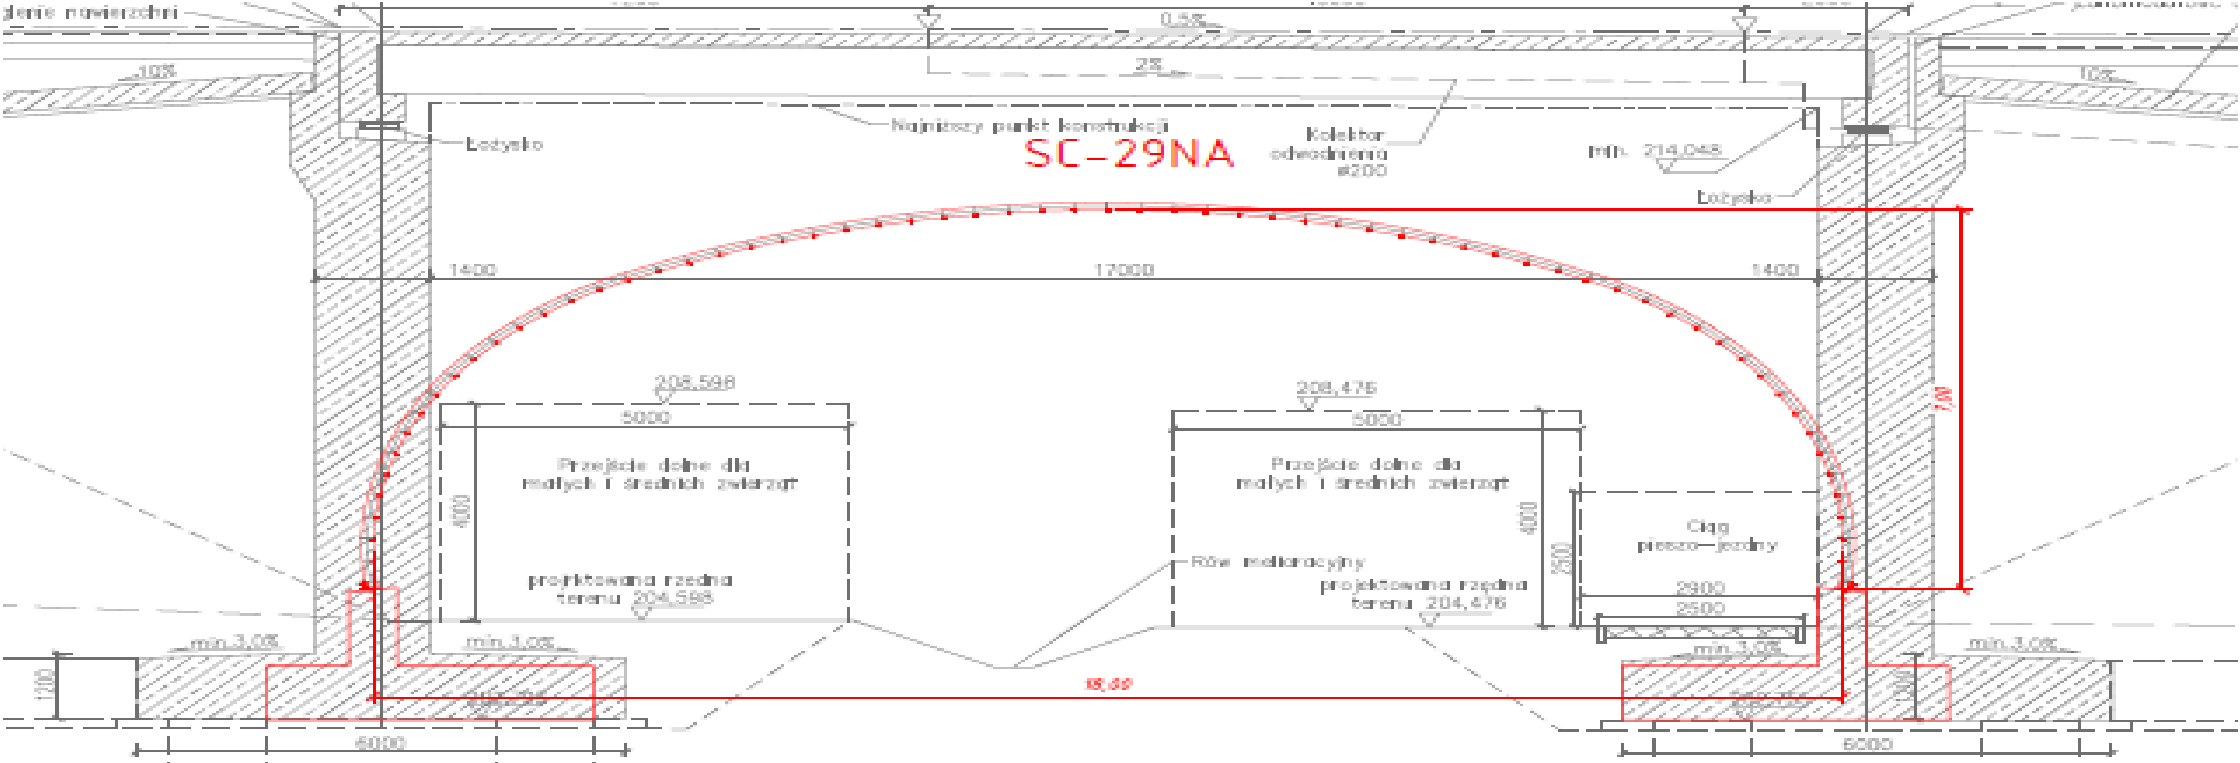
longitudinal section of concrete bridge – Alternative 1.
